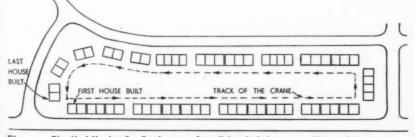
Site "A," site for 62 houses of traditional design, on which mobile crane was used. (Site "B" was similar.)
